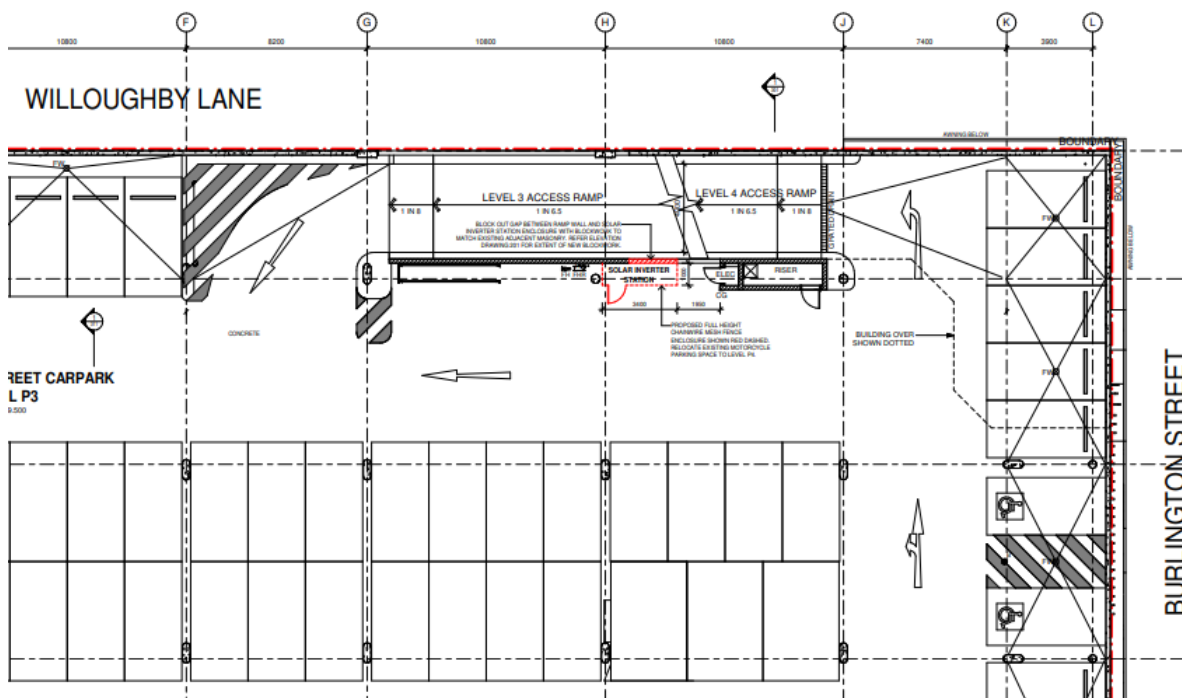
Alexander Street carpark Level P3 indicating location of Solar Inverter Station and minor works (excerpt of plan 101, NBR5 Architecture)
